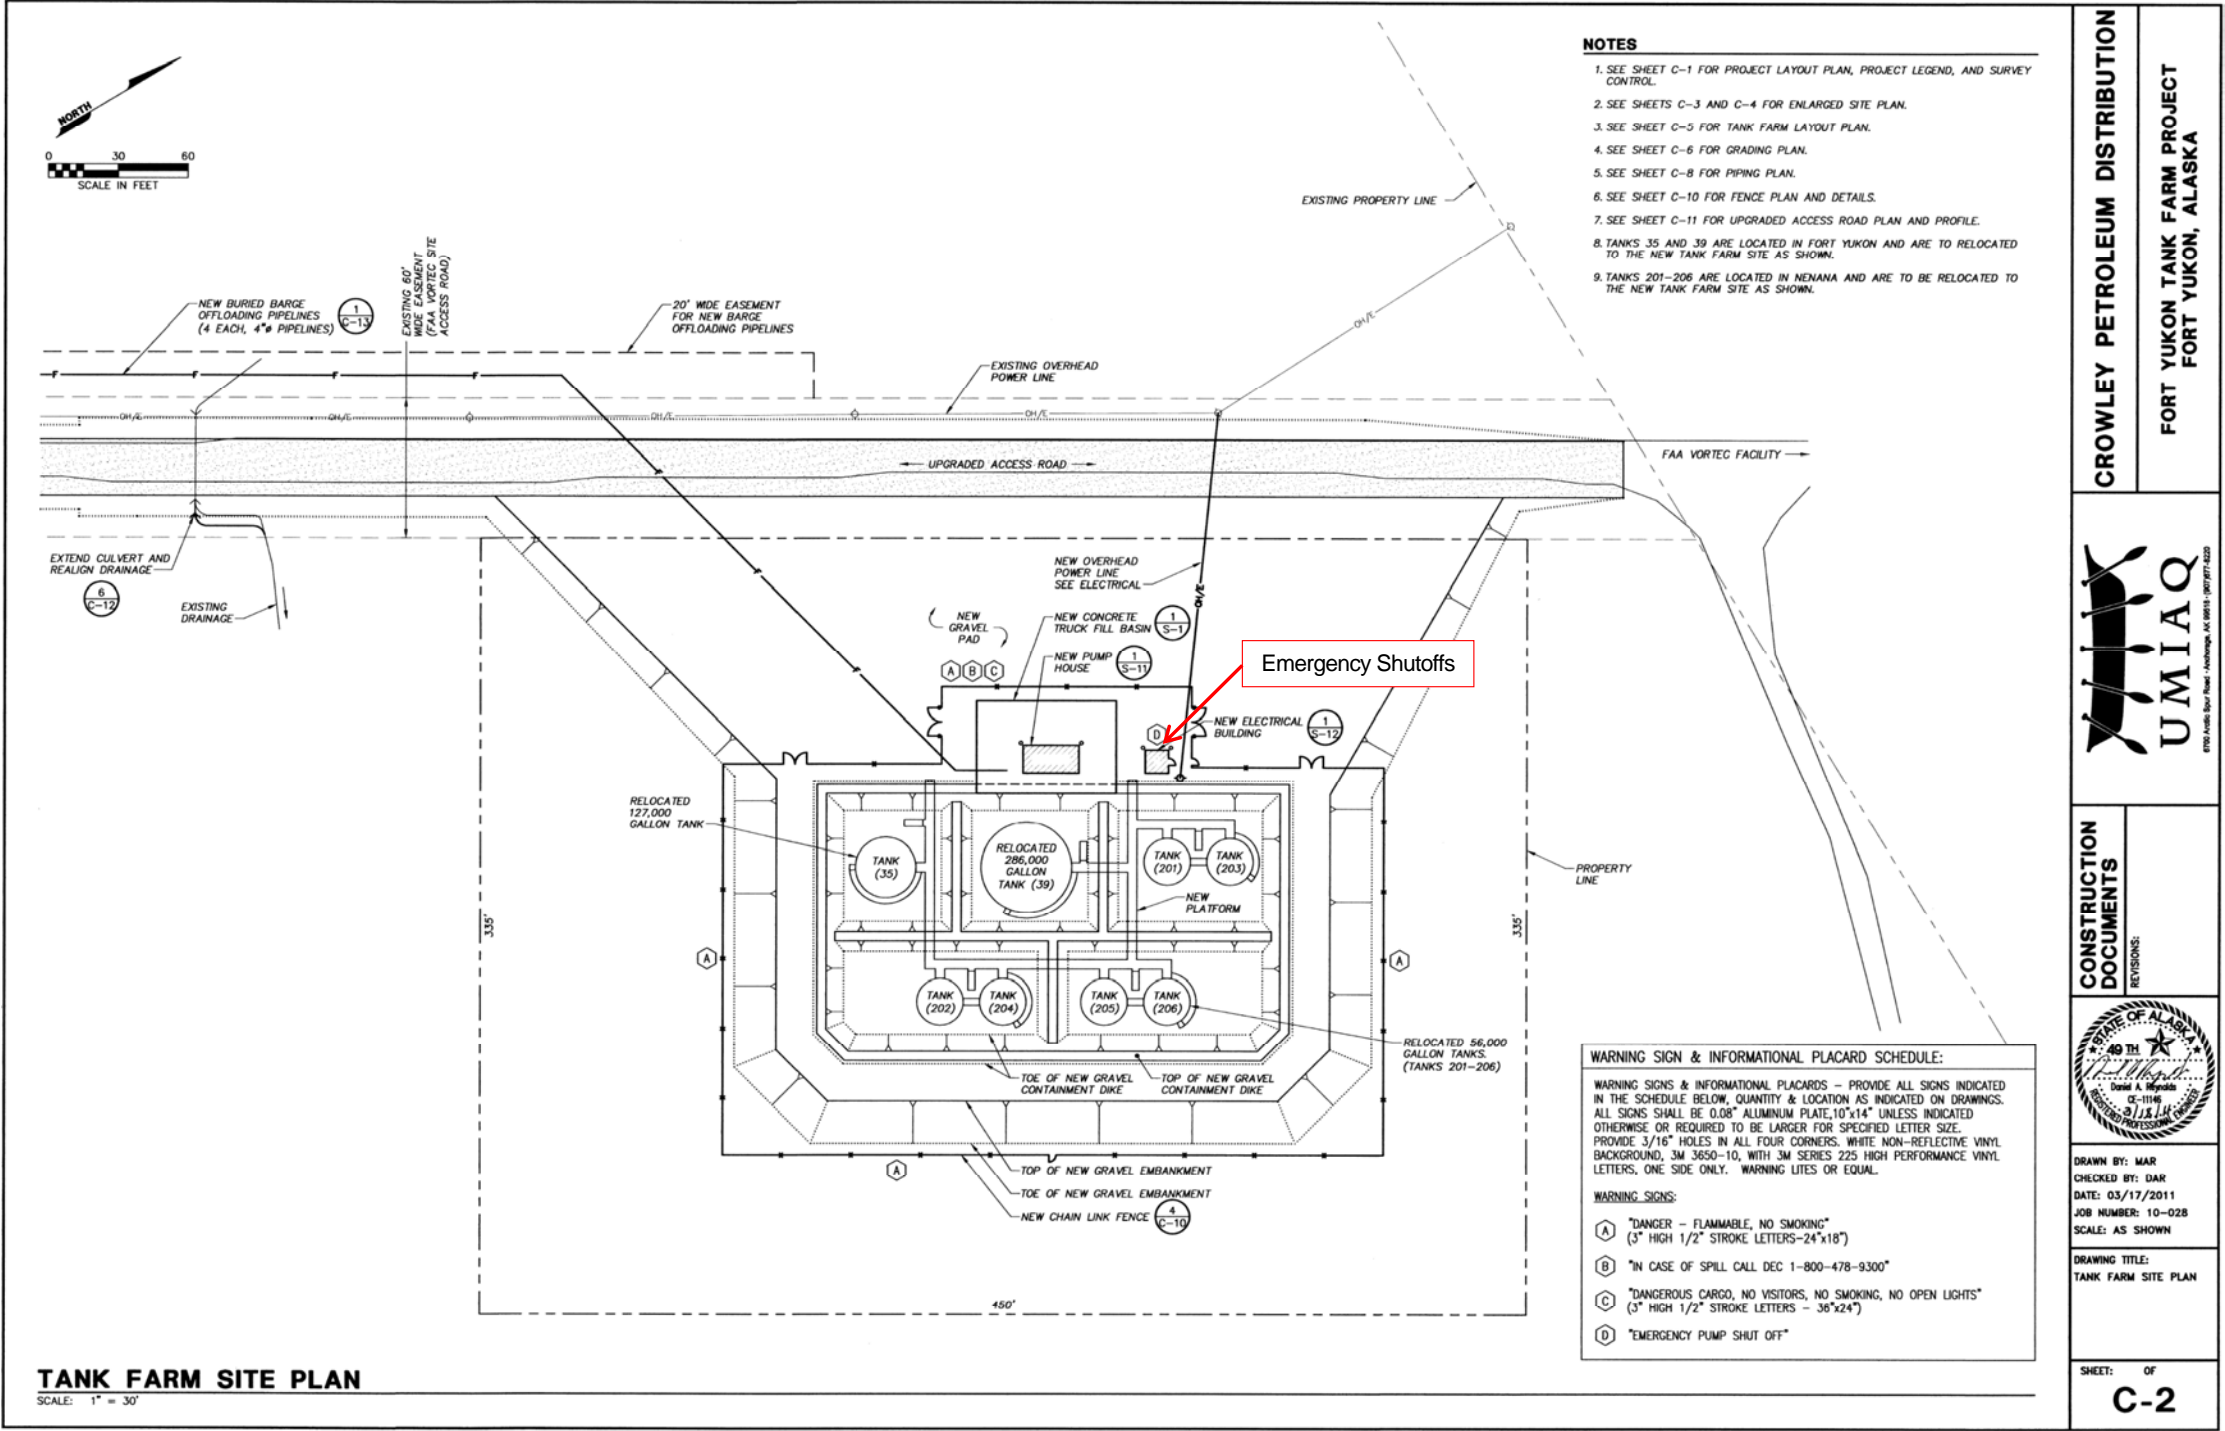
Tank Farm Secondary Containment Area and Drainage
